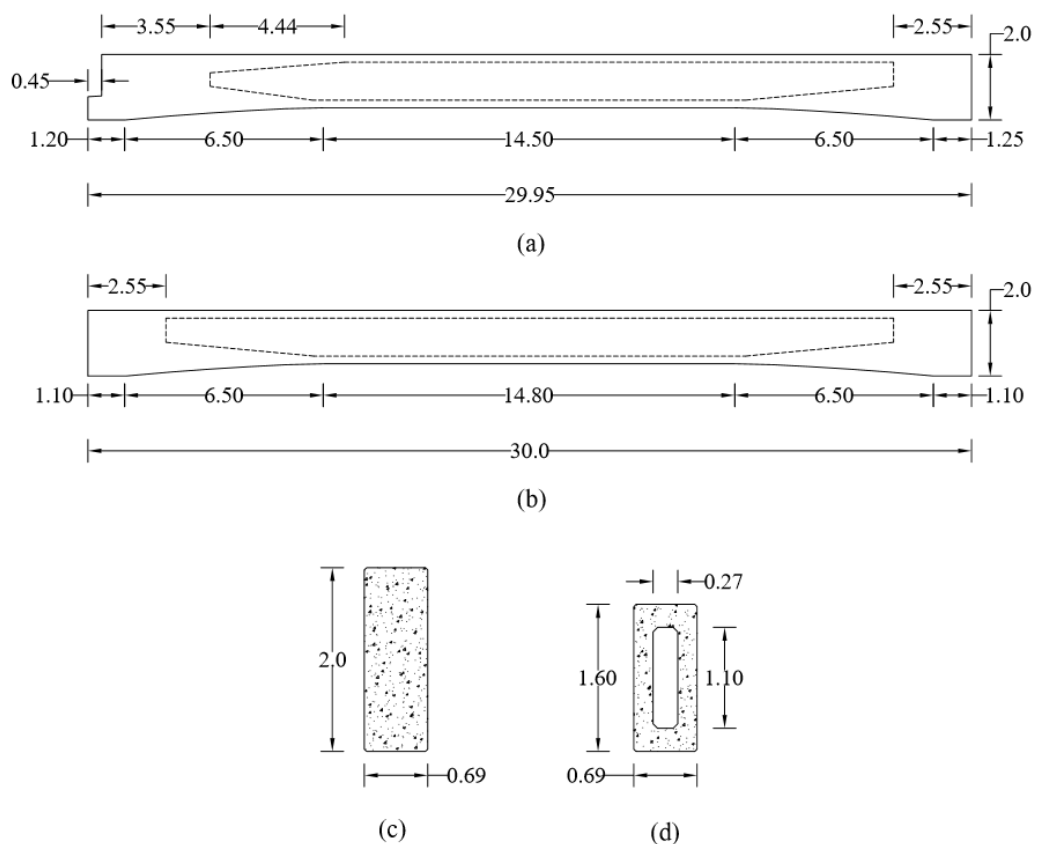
Dimensional details of precast girders (a) exterior girder, (b) interior girder, (c) end section, and (d) middle section (units in metres).
